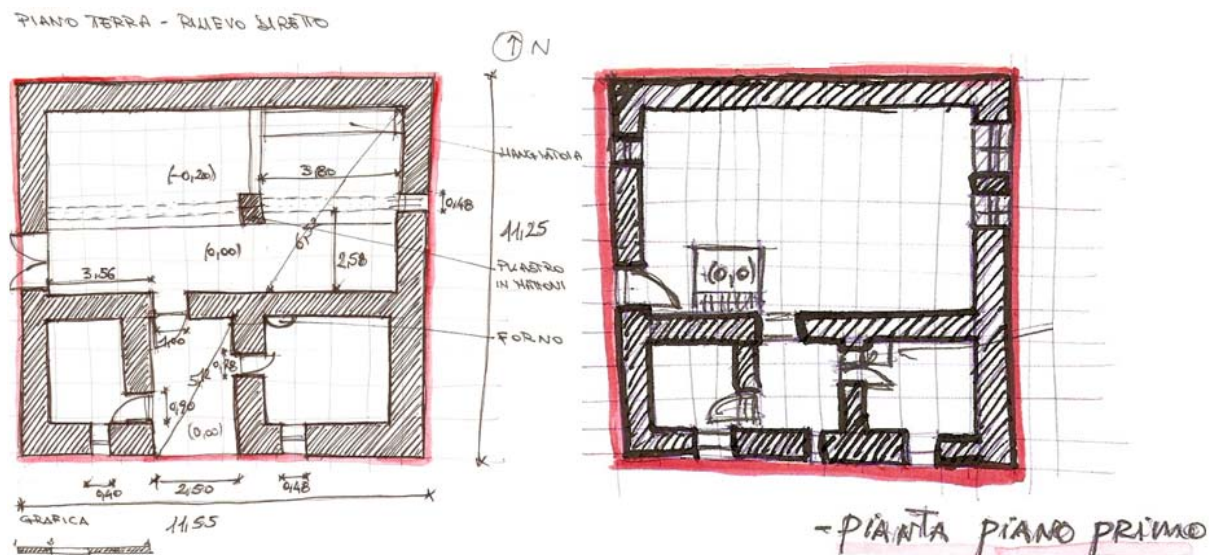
Metric plan of ground floor and first floor – caserio Oar Azpikoa
